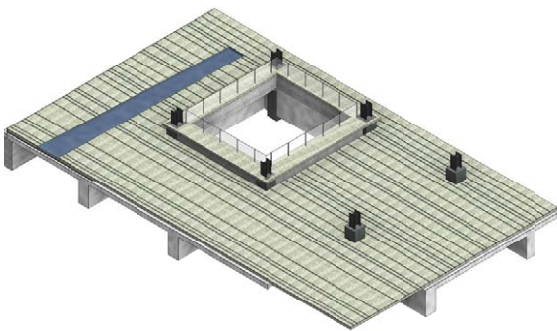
Timber shuttered concrete pavers on ground floor (Author 2018)
